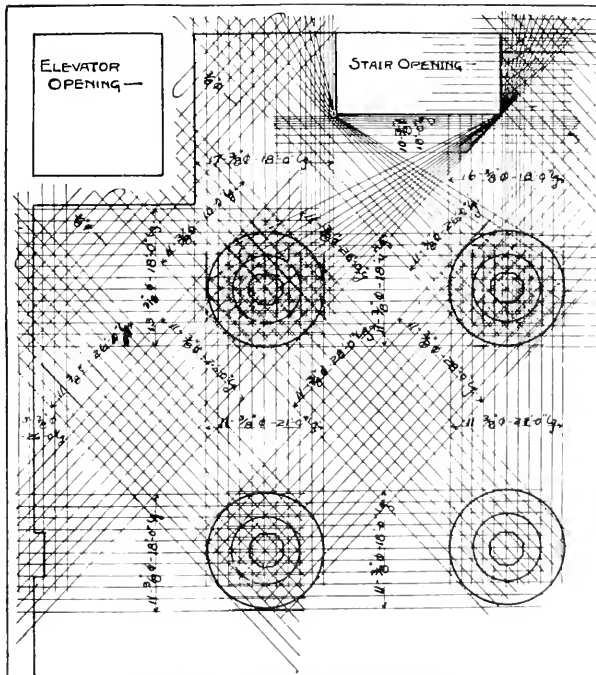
Slab Reinforcement, Mushroom System, in a wall bearing building; panels about 16 ft.
